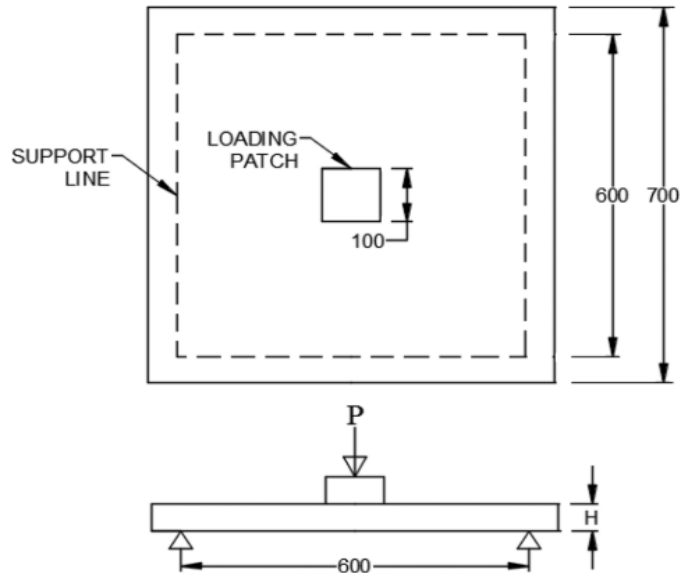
Central point load tests on SFRC slabs (Note: All dimensions are in mm)
